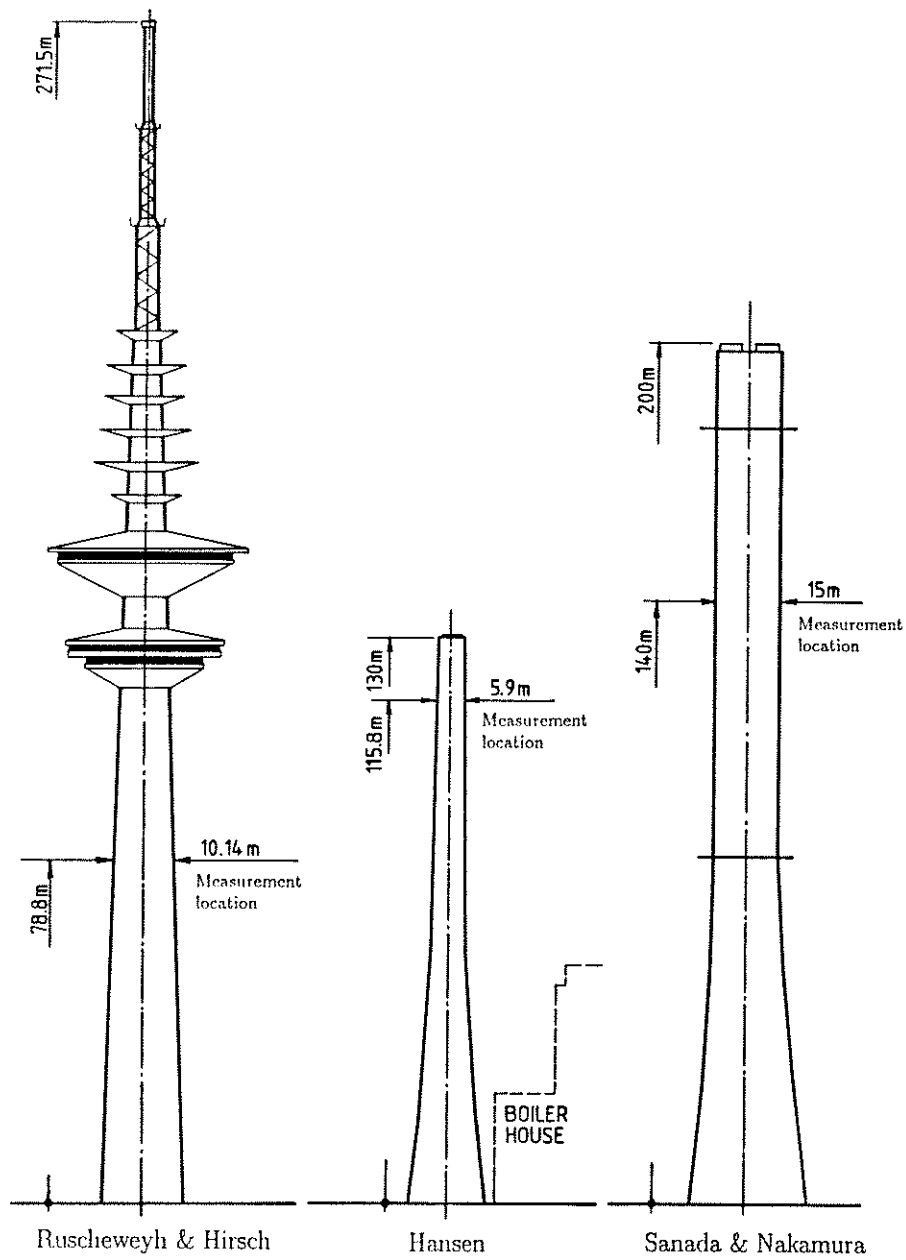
Concrete tower & chimney stacks used for full-scale measurements.
